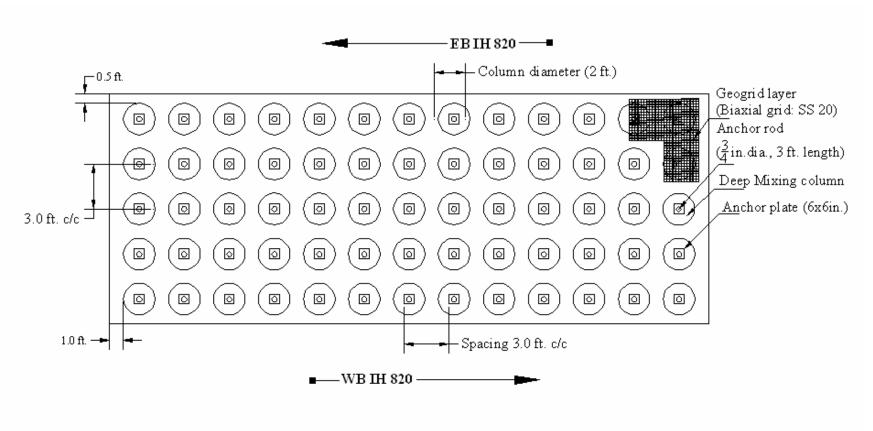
Plan View of DSM Column Layout of Test Site 2 (15 ft X 40 ft)
